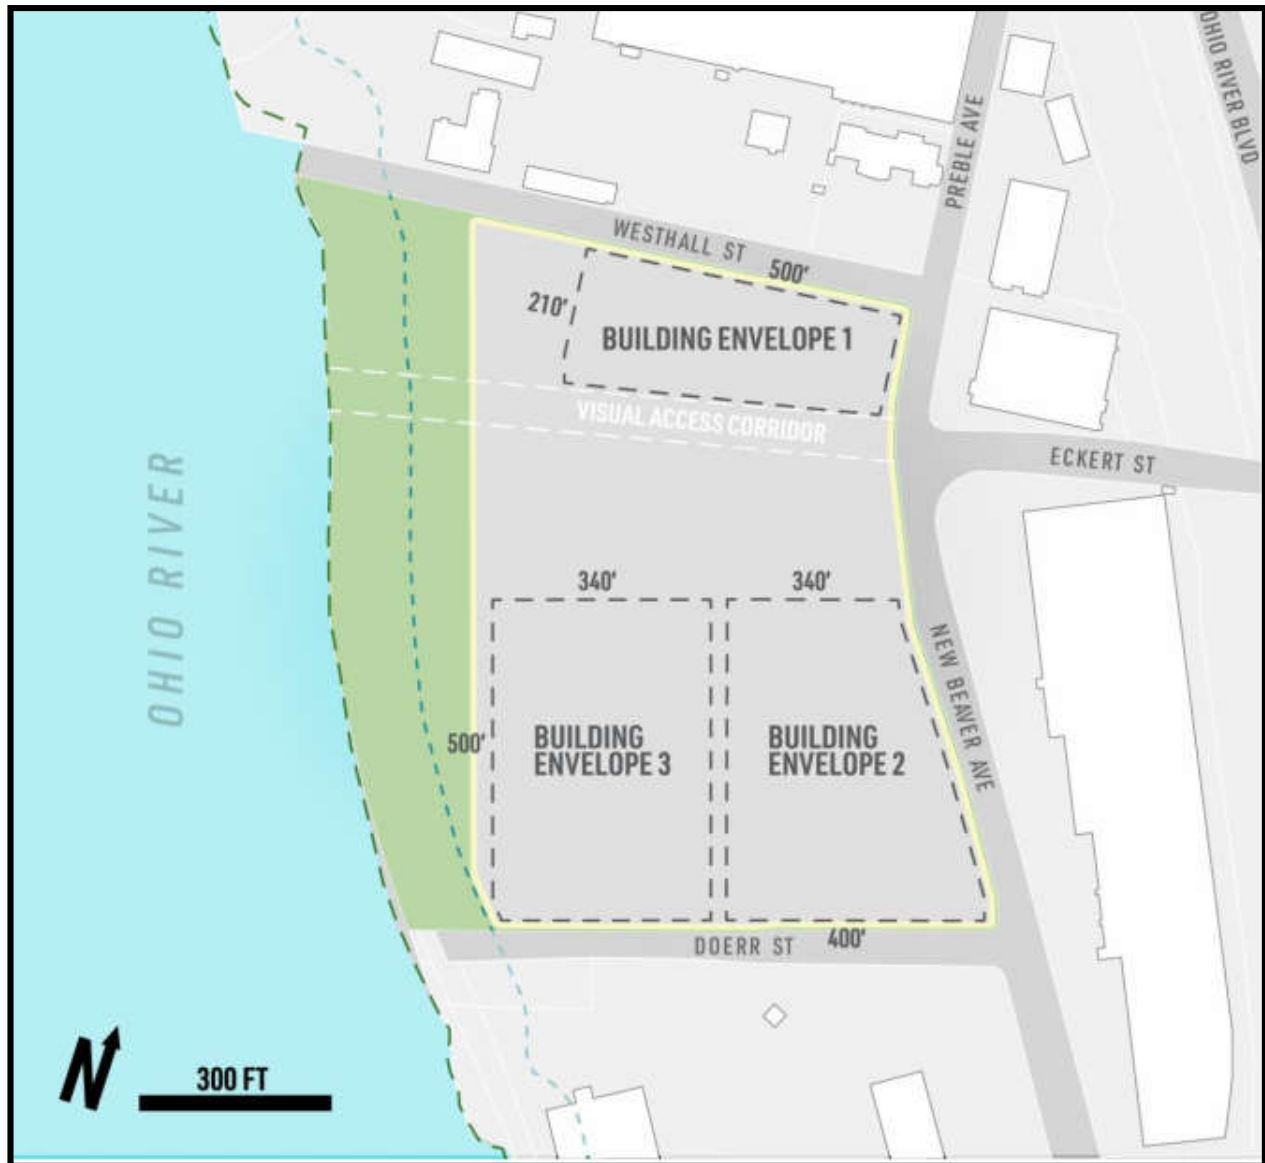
Proposed Site Reuse Approach – Site Development Scenario A (~371,000 SF Building Envelope Area)
